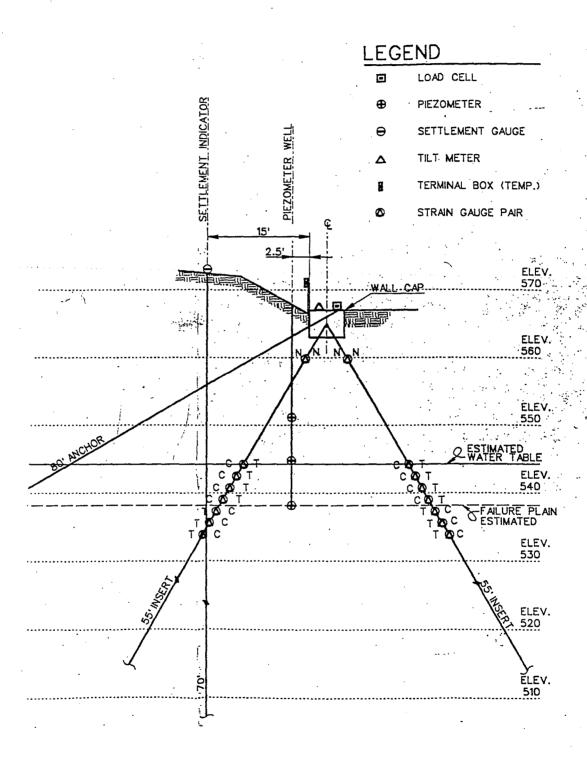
Cross-section of Instrumented Wall at Station 2+70. (Wolosick, 1994)
